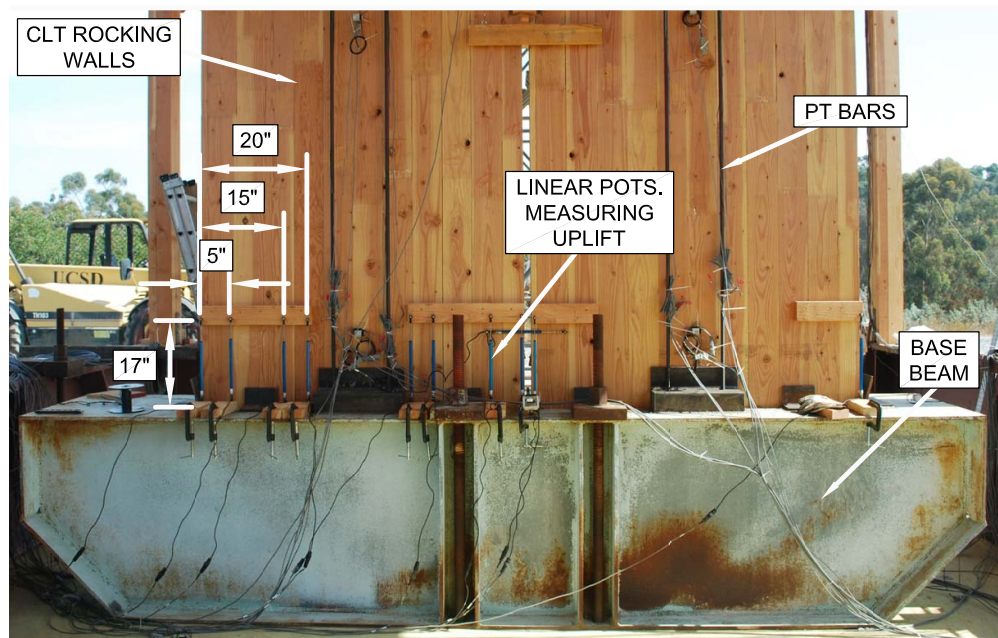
Typical layout of linear pots to measure wall rocking and uplift
